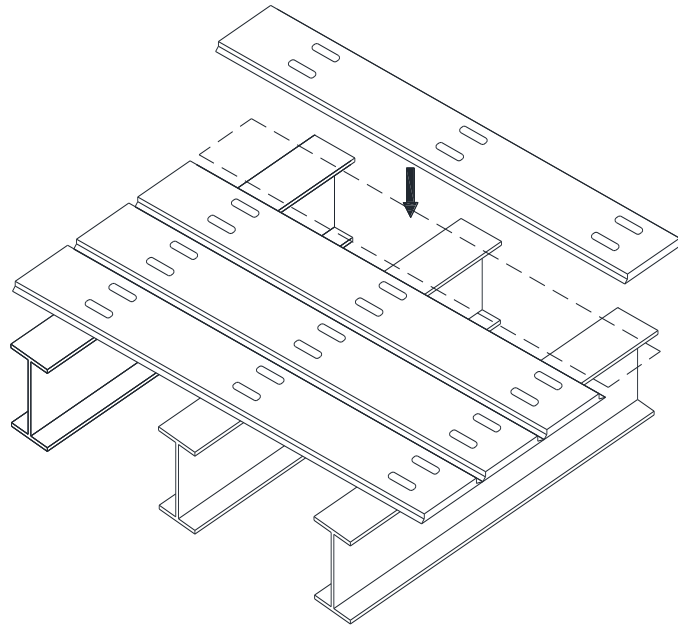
Isometric view of a precast full-depth, full width, deck panels placed transversally over girders
